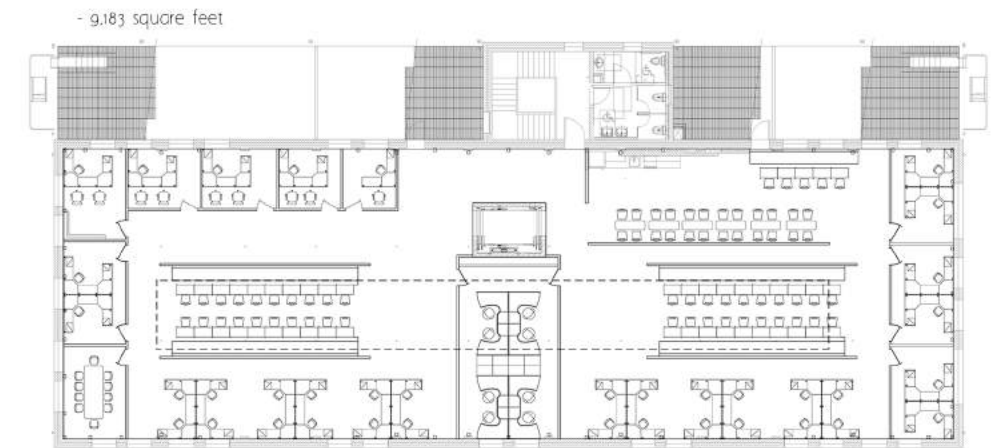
Nucleic Model Floor Plan - 3rd Floor - Collaborative Space Floor
